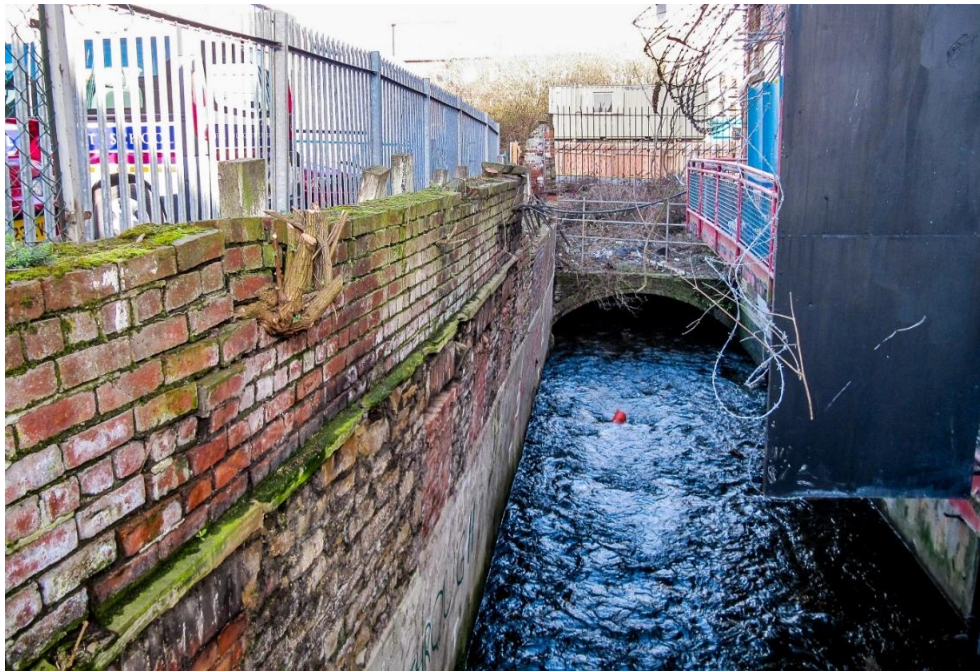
Culverted section of the Porter Brook at Matilda Street, Sheffield. Photographed facing downstream from road bridge. After deculverting, a portion of the car park to the left of the frame was converted into a pocket park which also provided additional floodwater storage.
